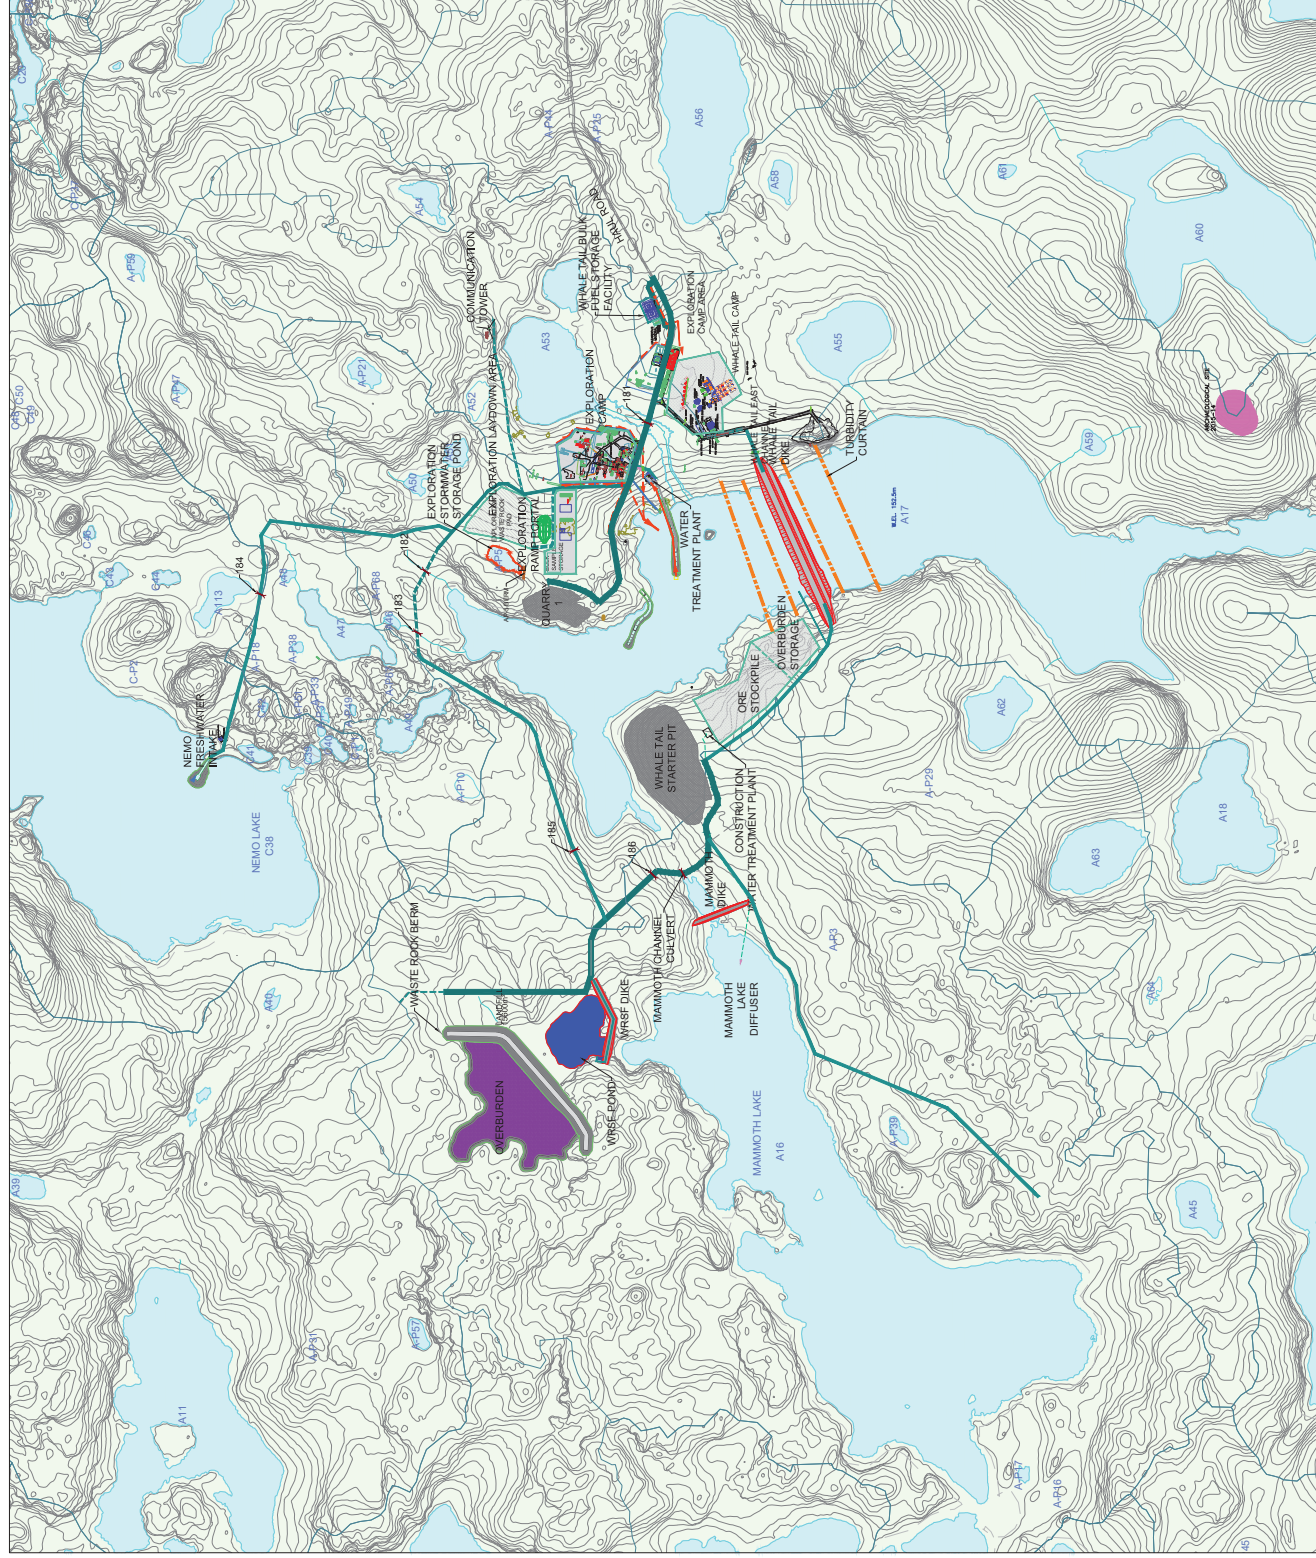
Yearly Site Layout Plan (Year -1: 2018)
